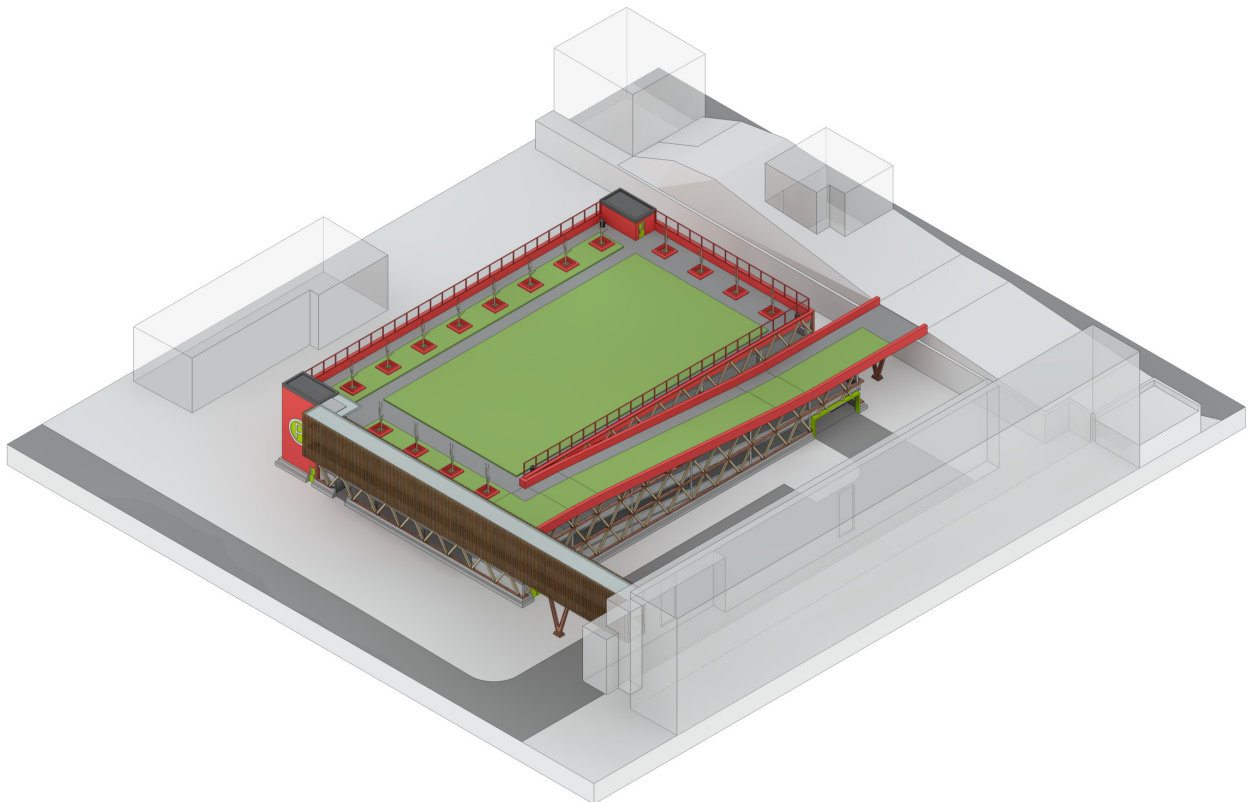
Axonometric view of the City Hall Parking structure, with its pedestrian connection to Wellington St. The parking structure also connects users and pedestrians to the Cambridge City Hall via an elevated walkway on the west side.
